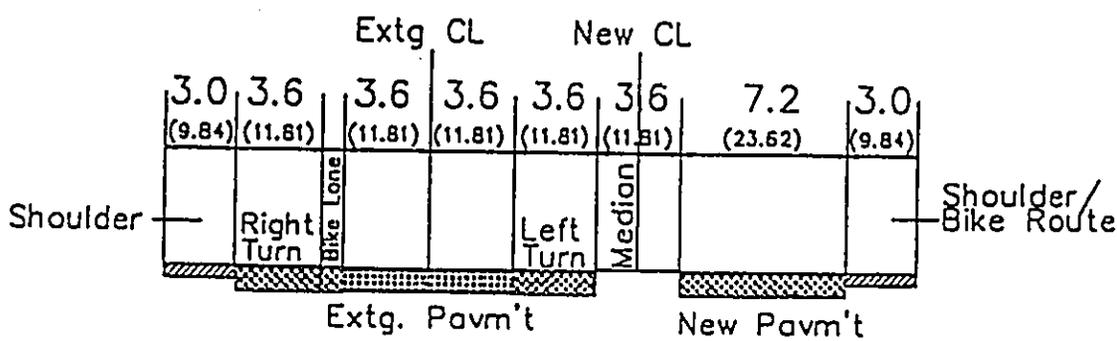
TYPICAL 4 LANE ROAD SECTION (Between Henry Street and Honokohau Harbor)
